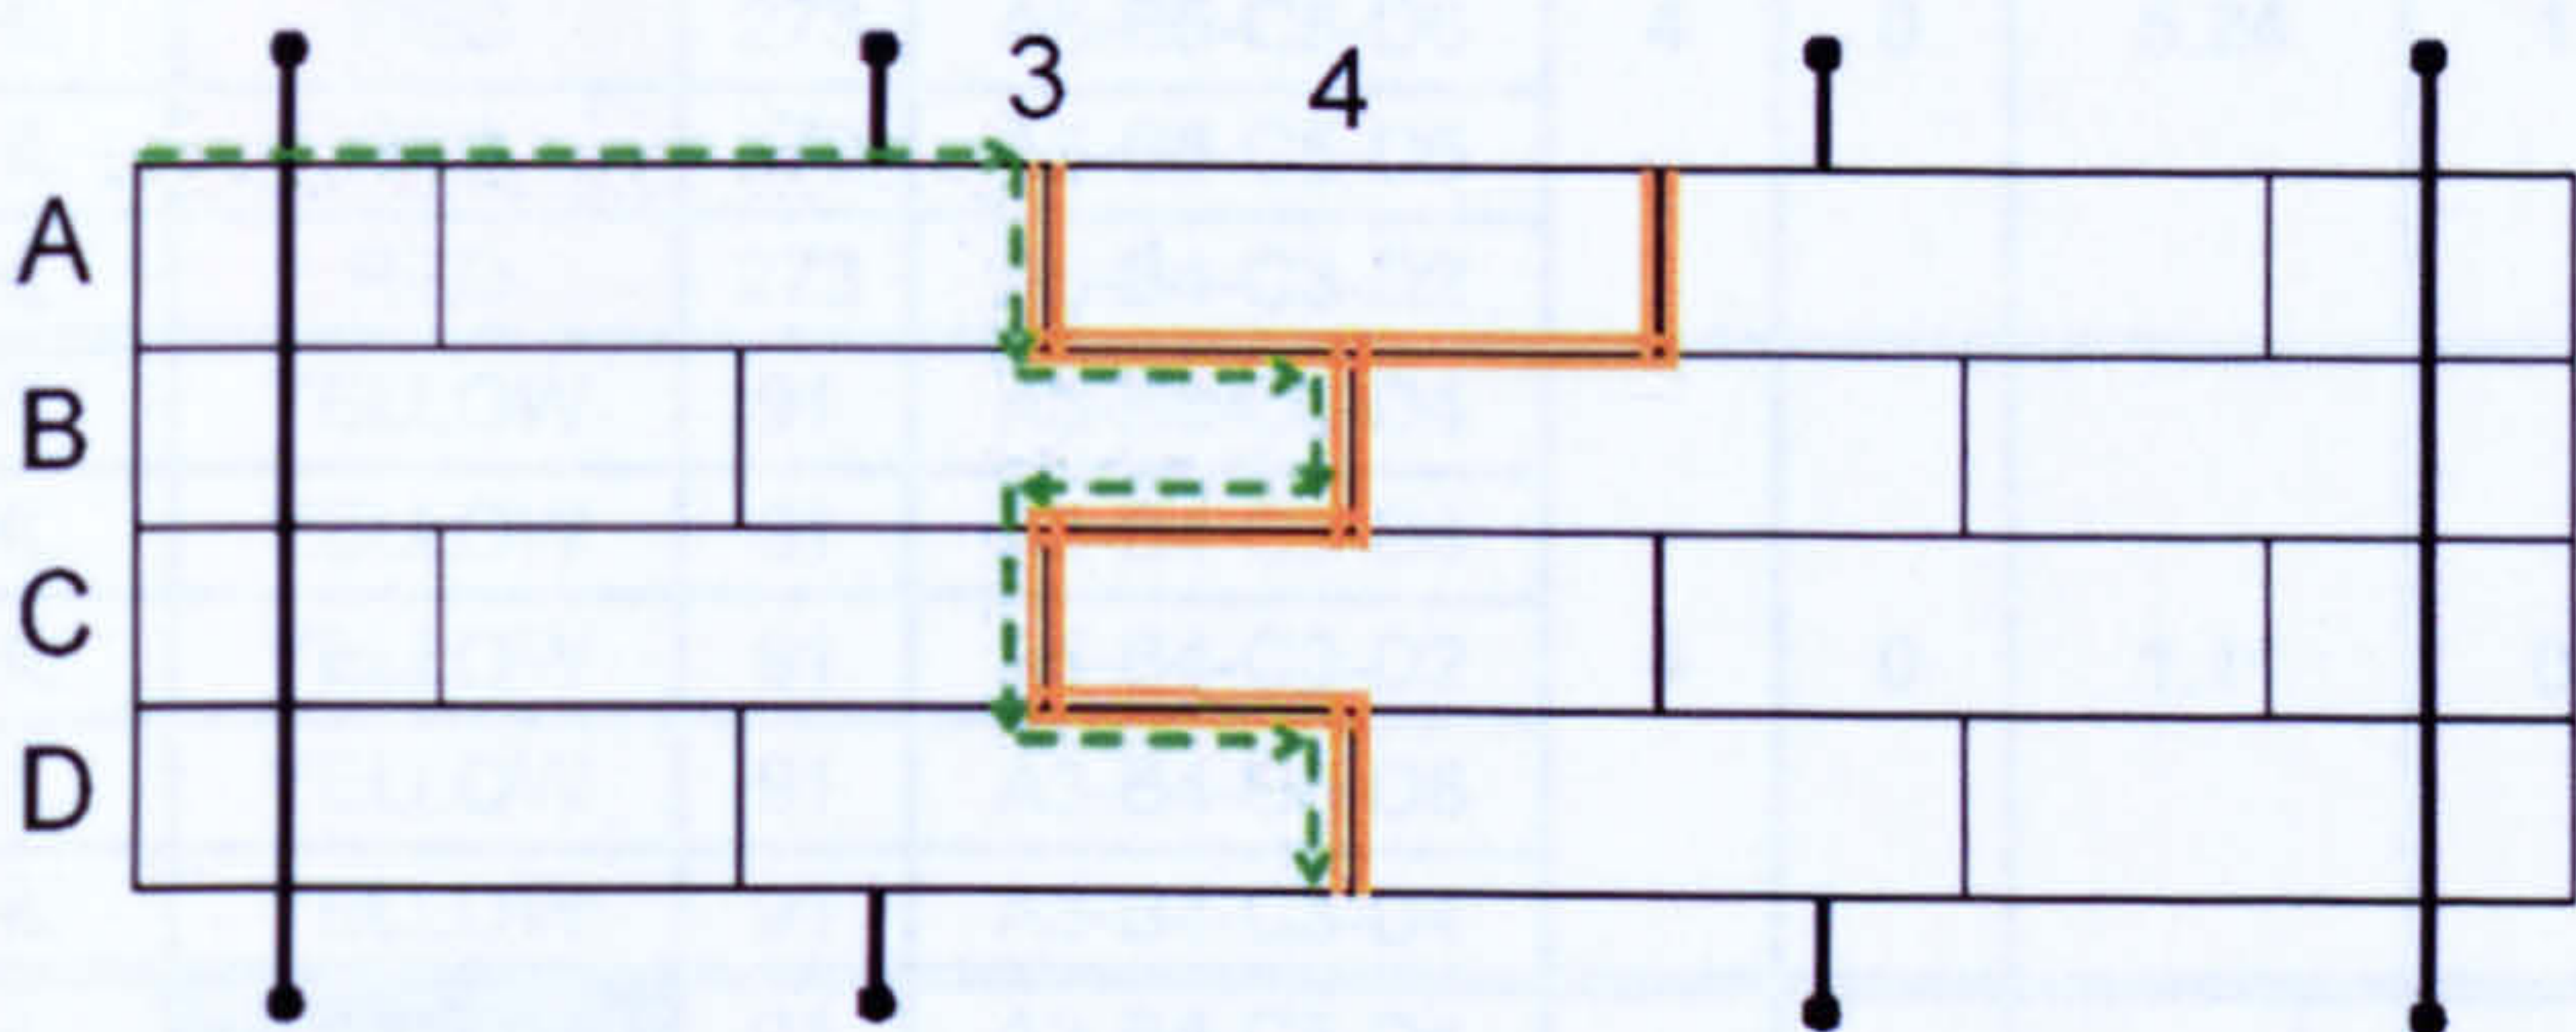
P wallettes – special case example wallette failure pattern
